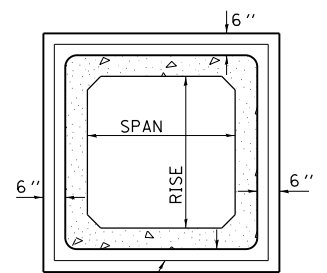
DETAILS OF CONCRETE COLLAR FOR PRECAST BOX CULVERT
